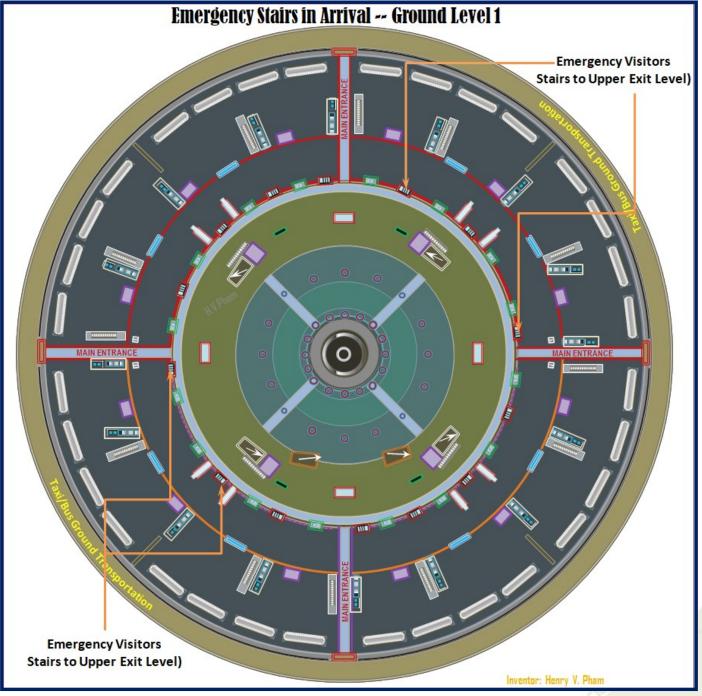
OH SMART AIRPORT - Emergency Stairs Exit up to Ground Level
